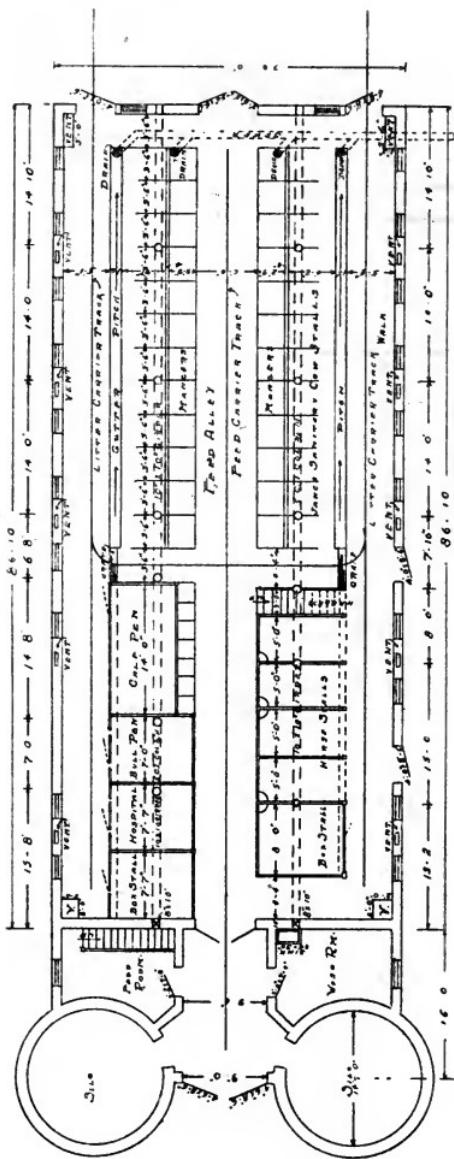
First floor plan of model barn, Wisconsin State Fair Grounds, showing relation of silos to feeding, etc.—Courtesy James Mfg. Co., Ft. Atkinson, Wis.
